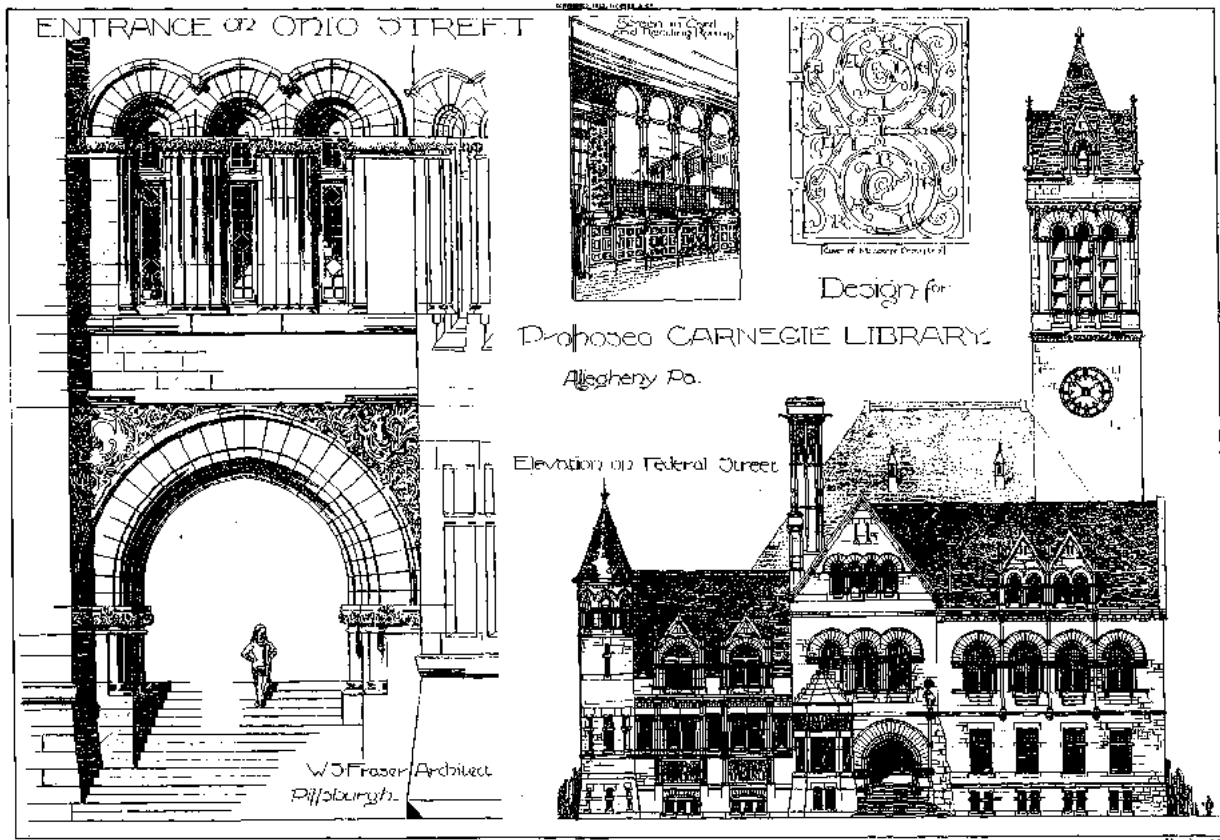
Elevation and details from Fraser's Carnegie Library of Allegheny submission, *The American Architect and Building News*, 12 February 1887.
